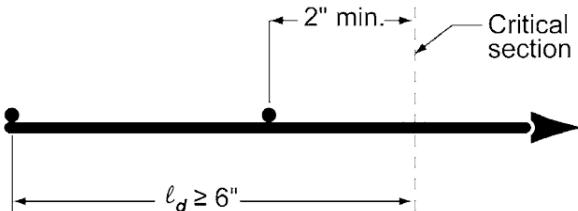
Development of Plain Welded Wire Reinforcement (adapted from ACI 318-14, courtesy of ACI)
